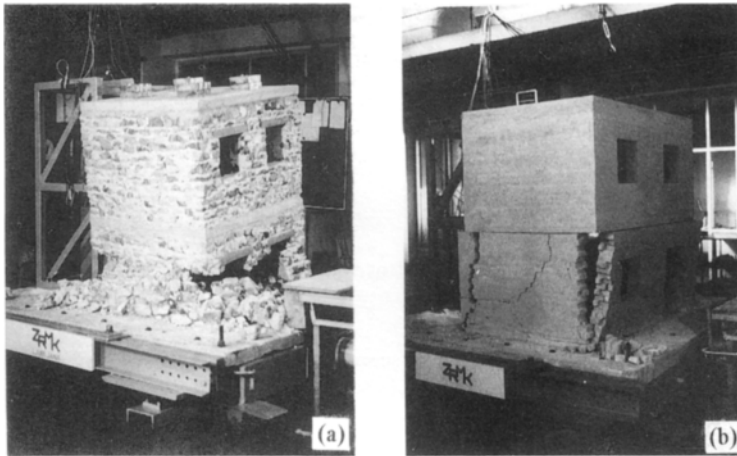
Mechanism of collapse of models with r.c. slabs.
